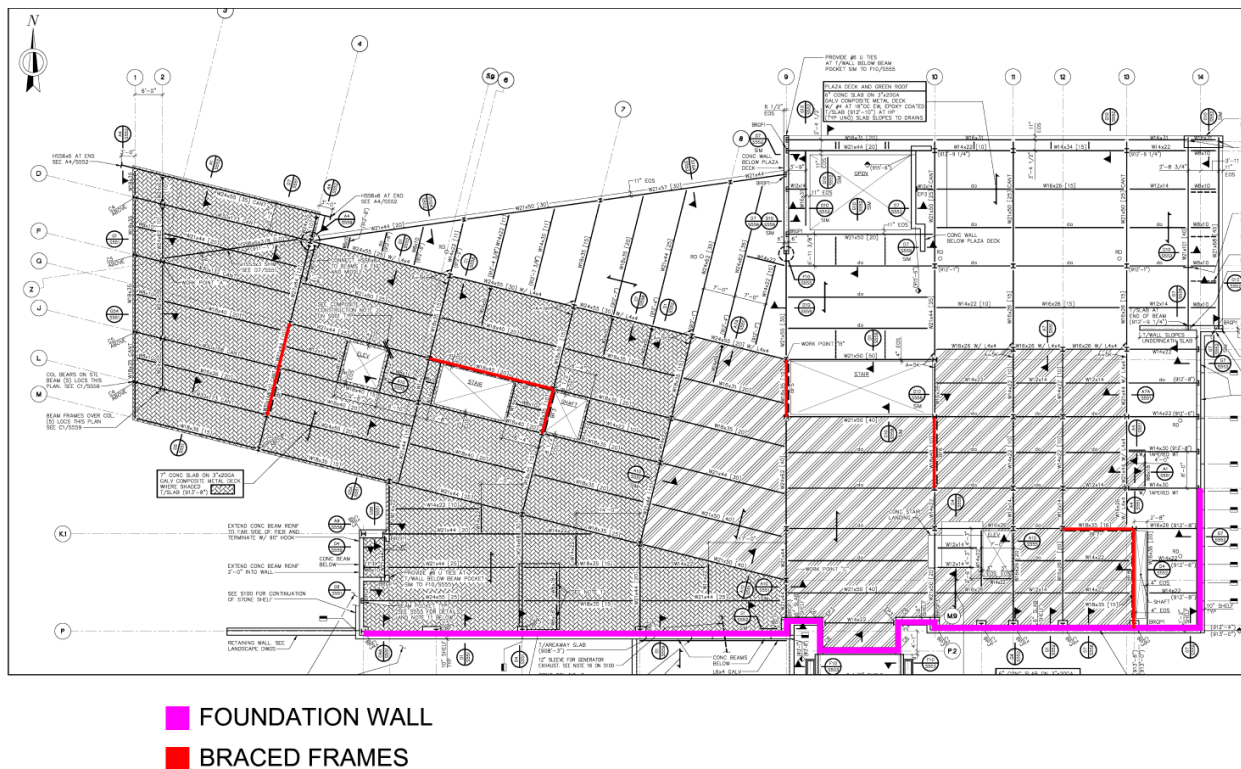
First Floor Framing Plan Showing Locations of Braced Frames and Foundation Walls
